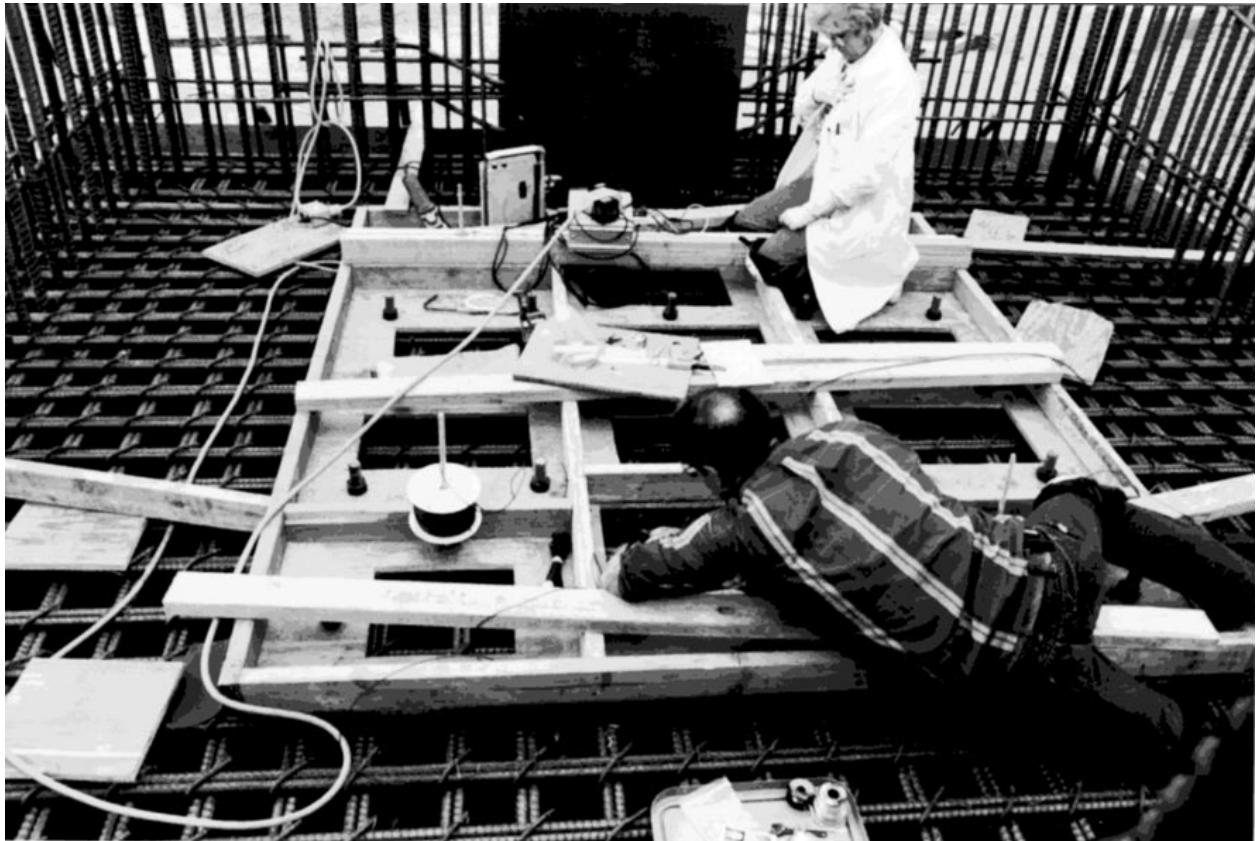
Technicians installing strain gauges in chamber prior to pouring concrete floor.
